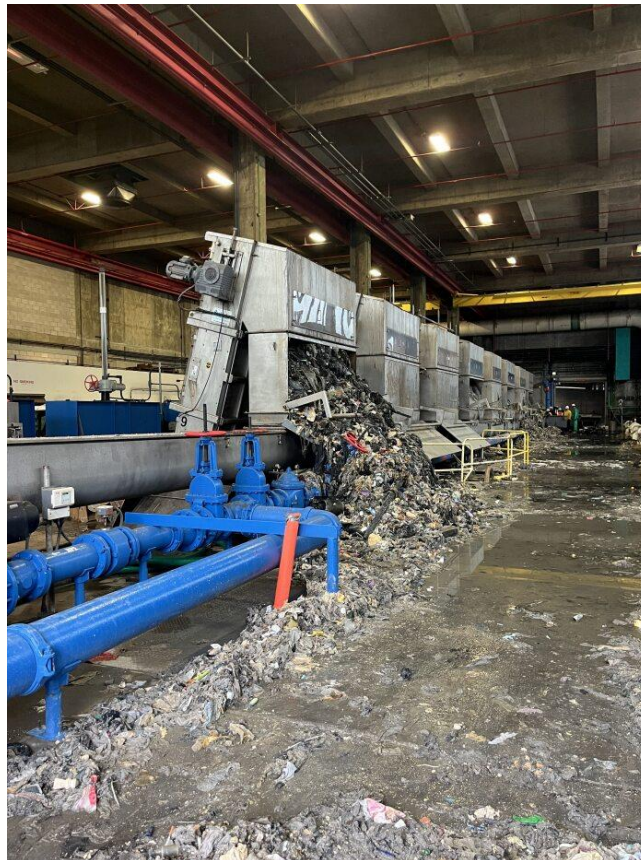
Damaged Hyperion Water Reclamation Plant Pump
